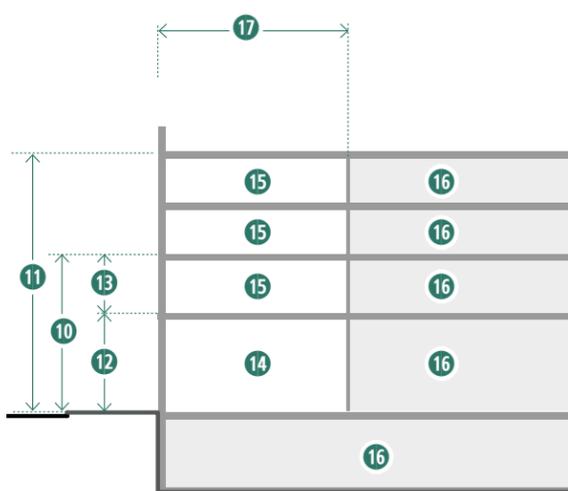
Storefront Building Section: Floor-to-Floor Height & Use Requirements
